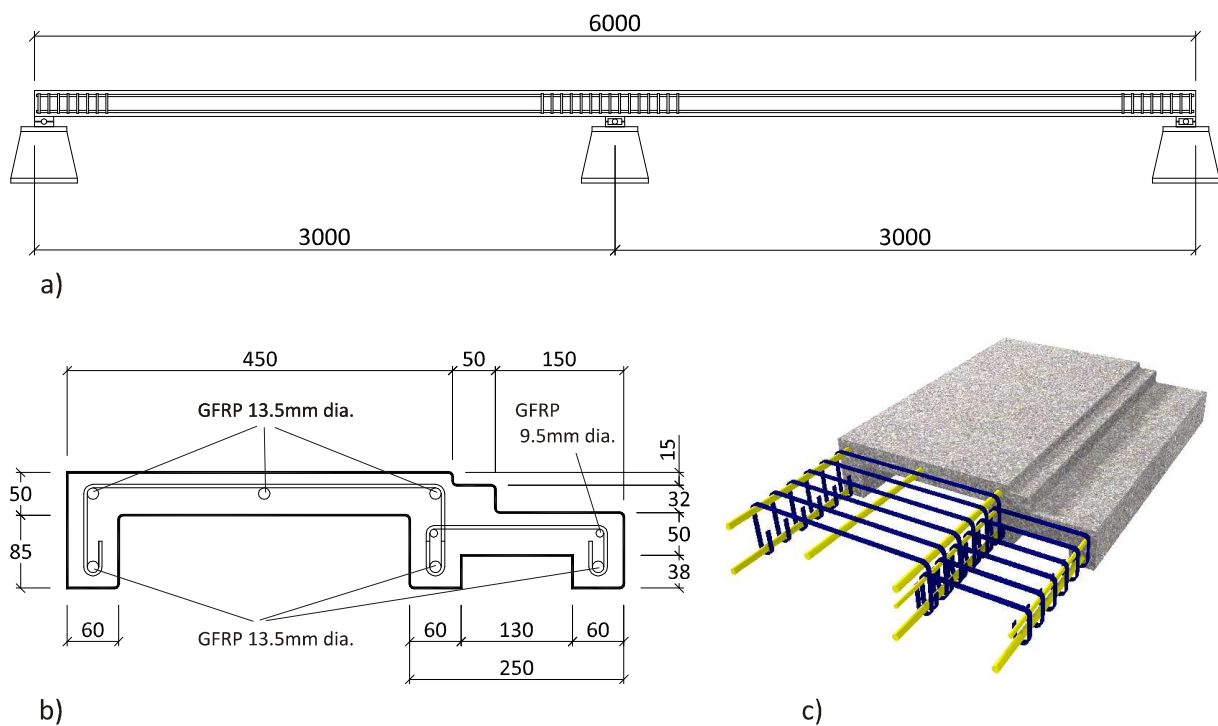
Reinforcement arrangement for the ULTra guideway (a) and cross section of the guideway (b, c) (all measurements in mm). The concrete section is reinforced with glass FRP bars and the shear links are made of glass fiber thermoplastic strips
